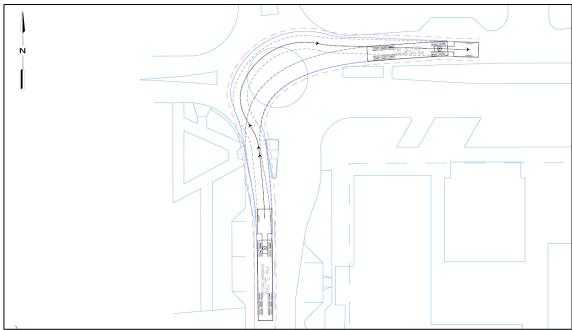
19.0m Semi Trailer Church Street/Dale Street Roundabout Egress
